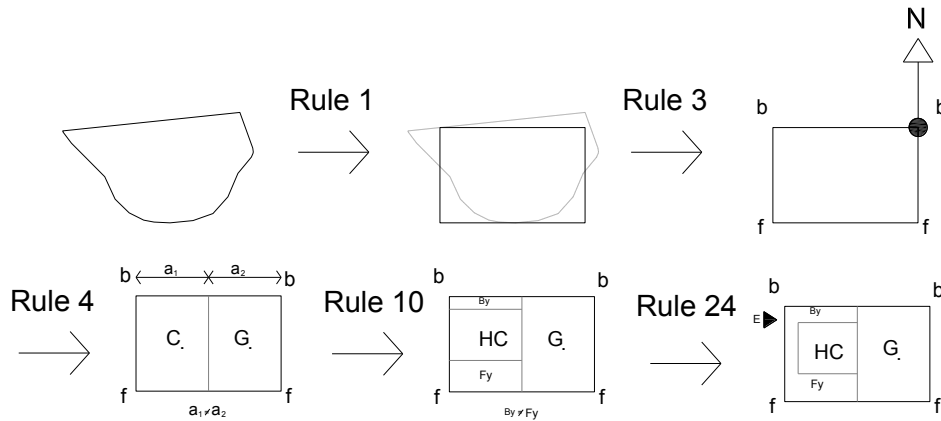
The process of application of rules 1, 3, 4, 10, and 24 to design a new rural house on a steep slope land within Perija. Up to this stage, the area for location of the living house, garden, entrance and outbuildings are defined. (C) Construction area, (G) Garden, (HC) living house construction area, (Fy) front yard, (By) back yard, (E) entrance, (f) front of the land, (b) back of the land.
